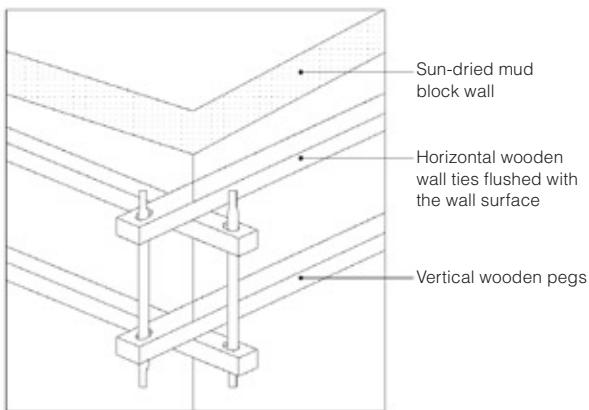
Seismic retrofit with horizontal and vertical wall ties, which are fixed like a protective framework, along the external facade of the earthen structures.
